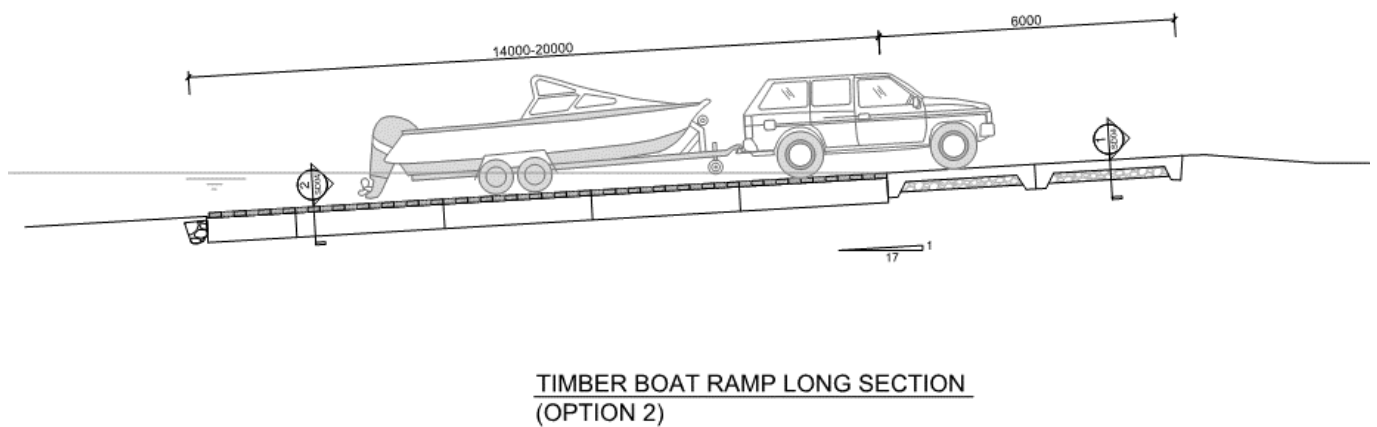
Proposed Boat Ramp – Option 2 – Timber Plank Ramp
